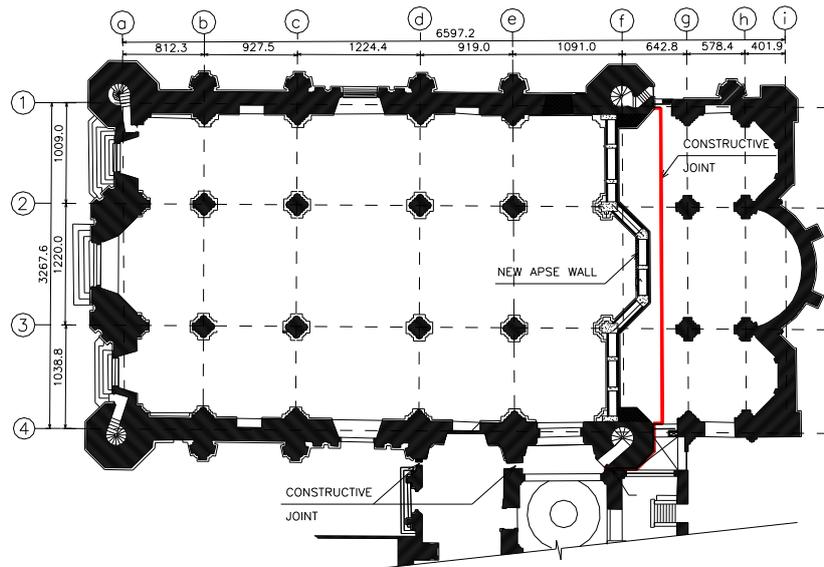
Recovery of the original geometry, new apse wall and constructive joint. (*dimensions in cm)
